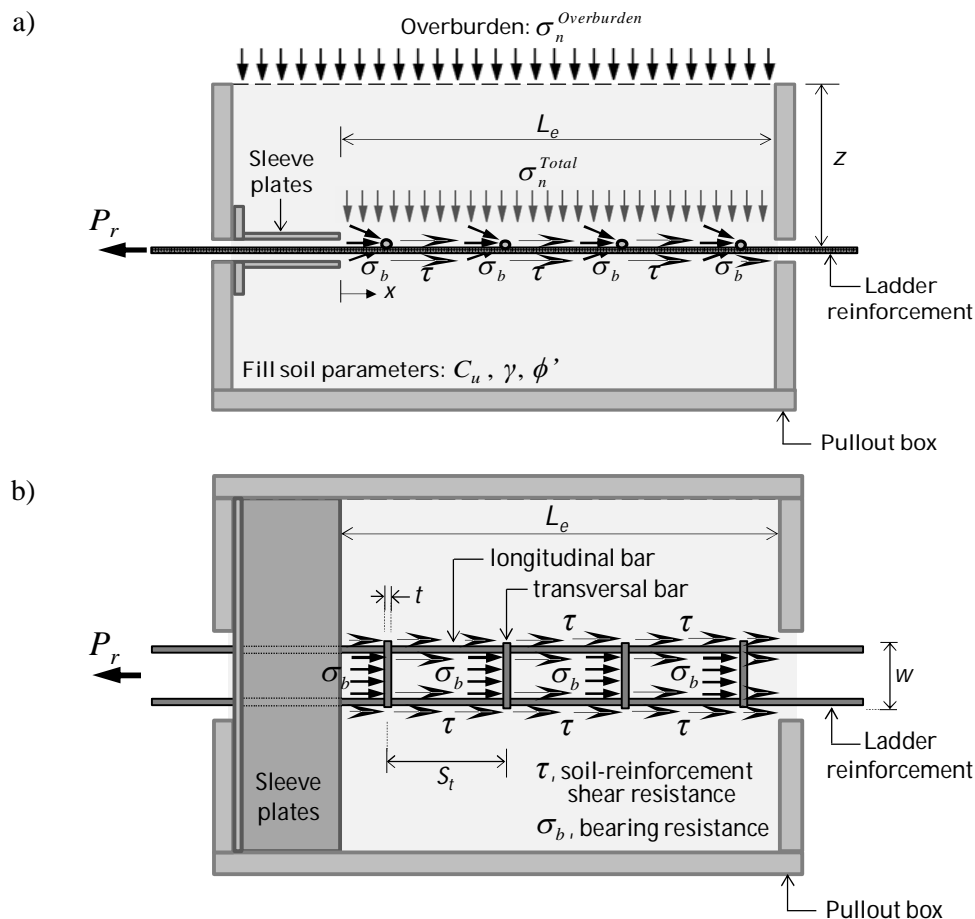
Steel ladder pullout test: lateral-vertical section (a) and plan section (b) views.
